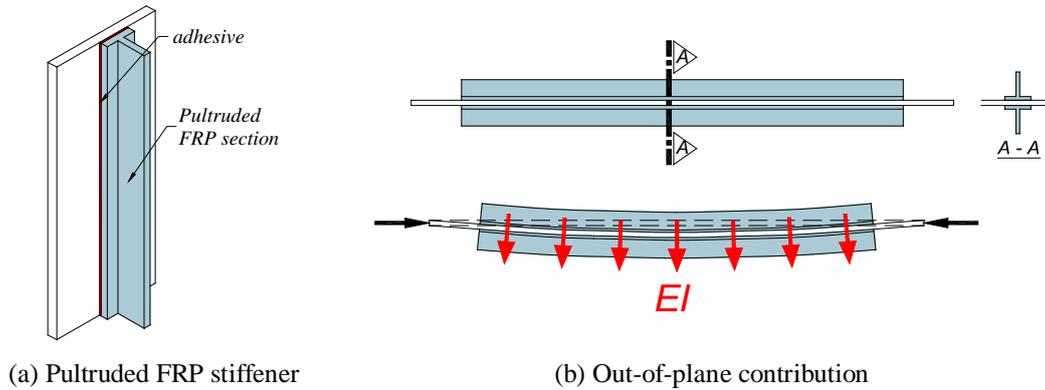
A typical FRP stiffener used in SBS strengthening (Okeil et al. 2009)
